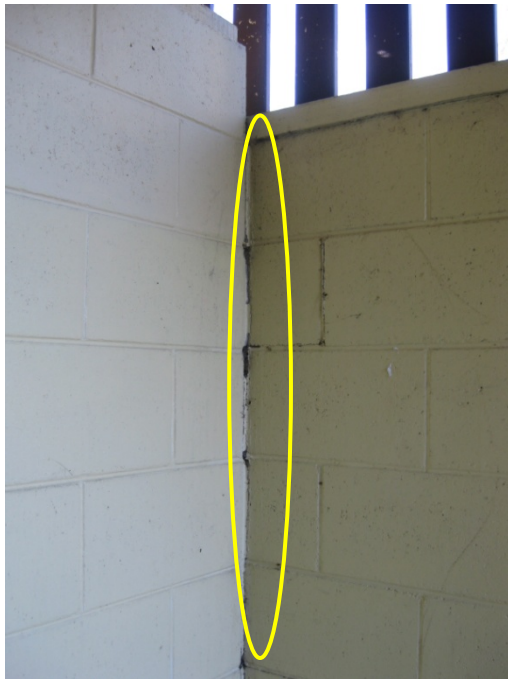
Cracking along the Mortar Joint in the NE Corner of the Joint
